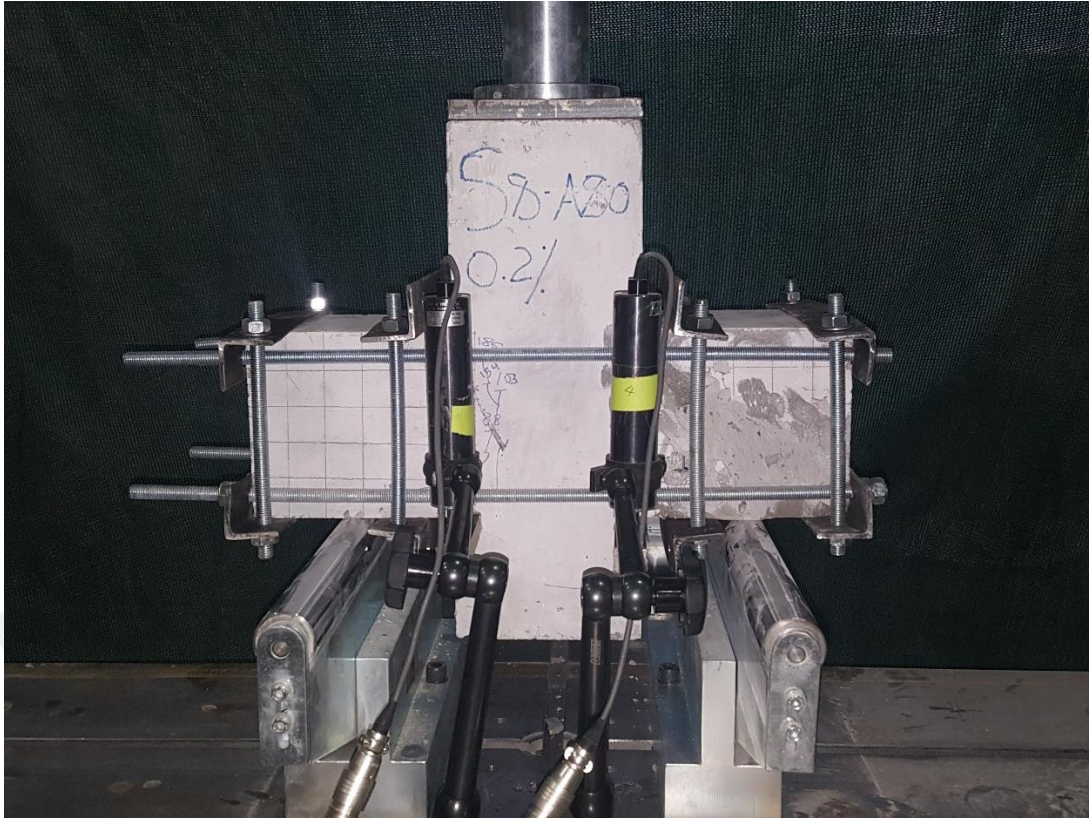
(Specimen S8 - A80 – 0.2%) in the test machine
